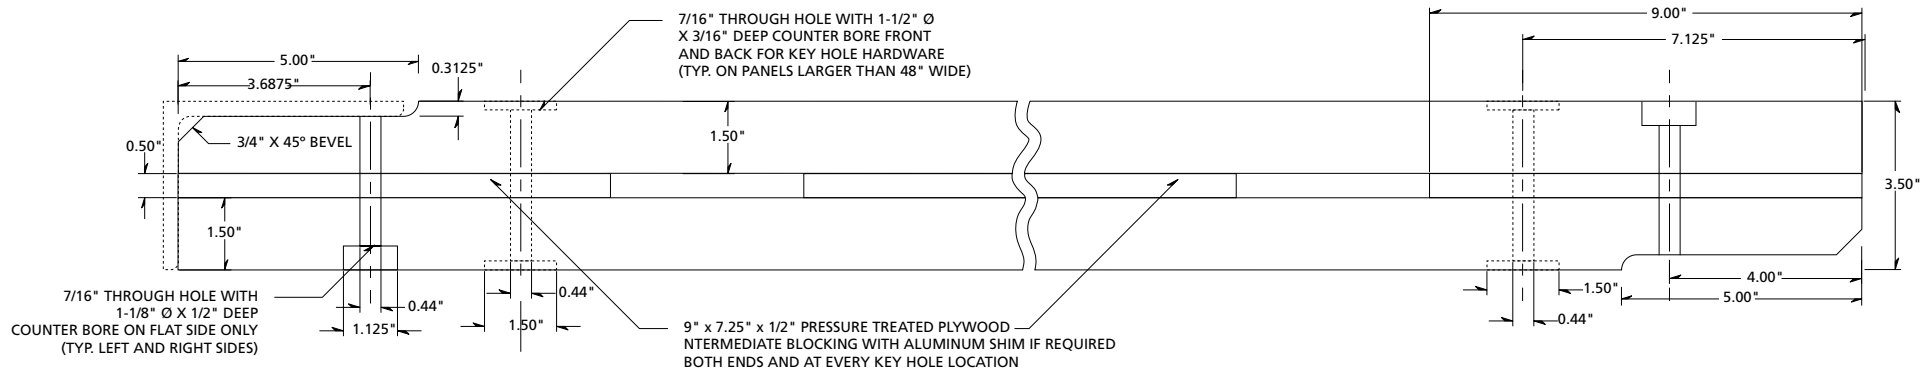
/2 x 3-1/2 x 3/16 POST ASSEMBLY SIDE ELEVATION
